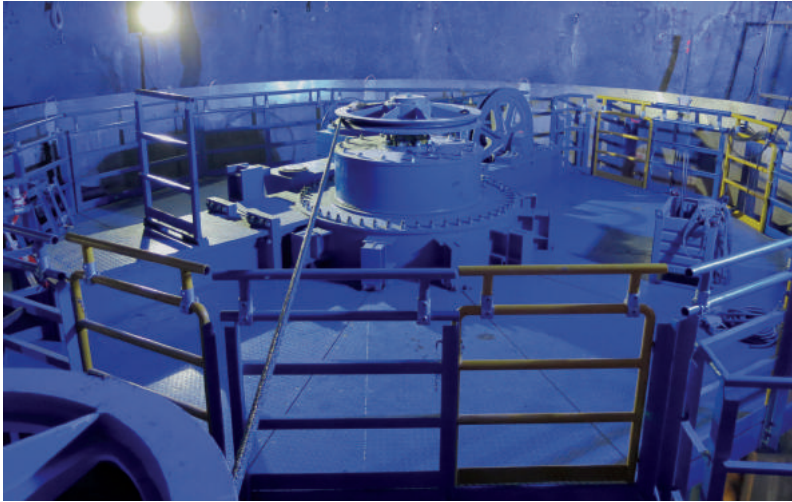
Revolving adjustable swivelling platform for guiding the cable supporting rope in the Shaft I cable sectors
